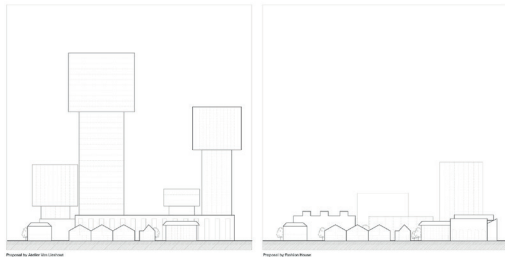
New Proposed by Fashion House Rotterdam
